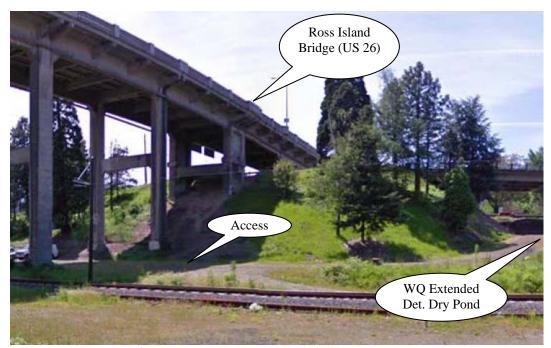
Looking west from Moody Avenue toward the facility and drainage area.
